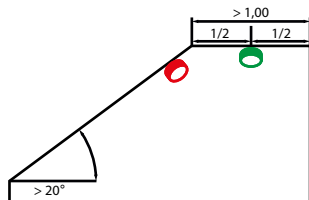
Straight mounting surface at least 1 m long and 1 m wide
